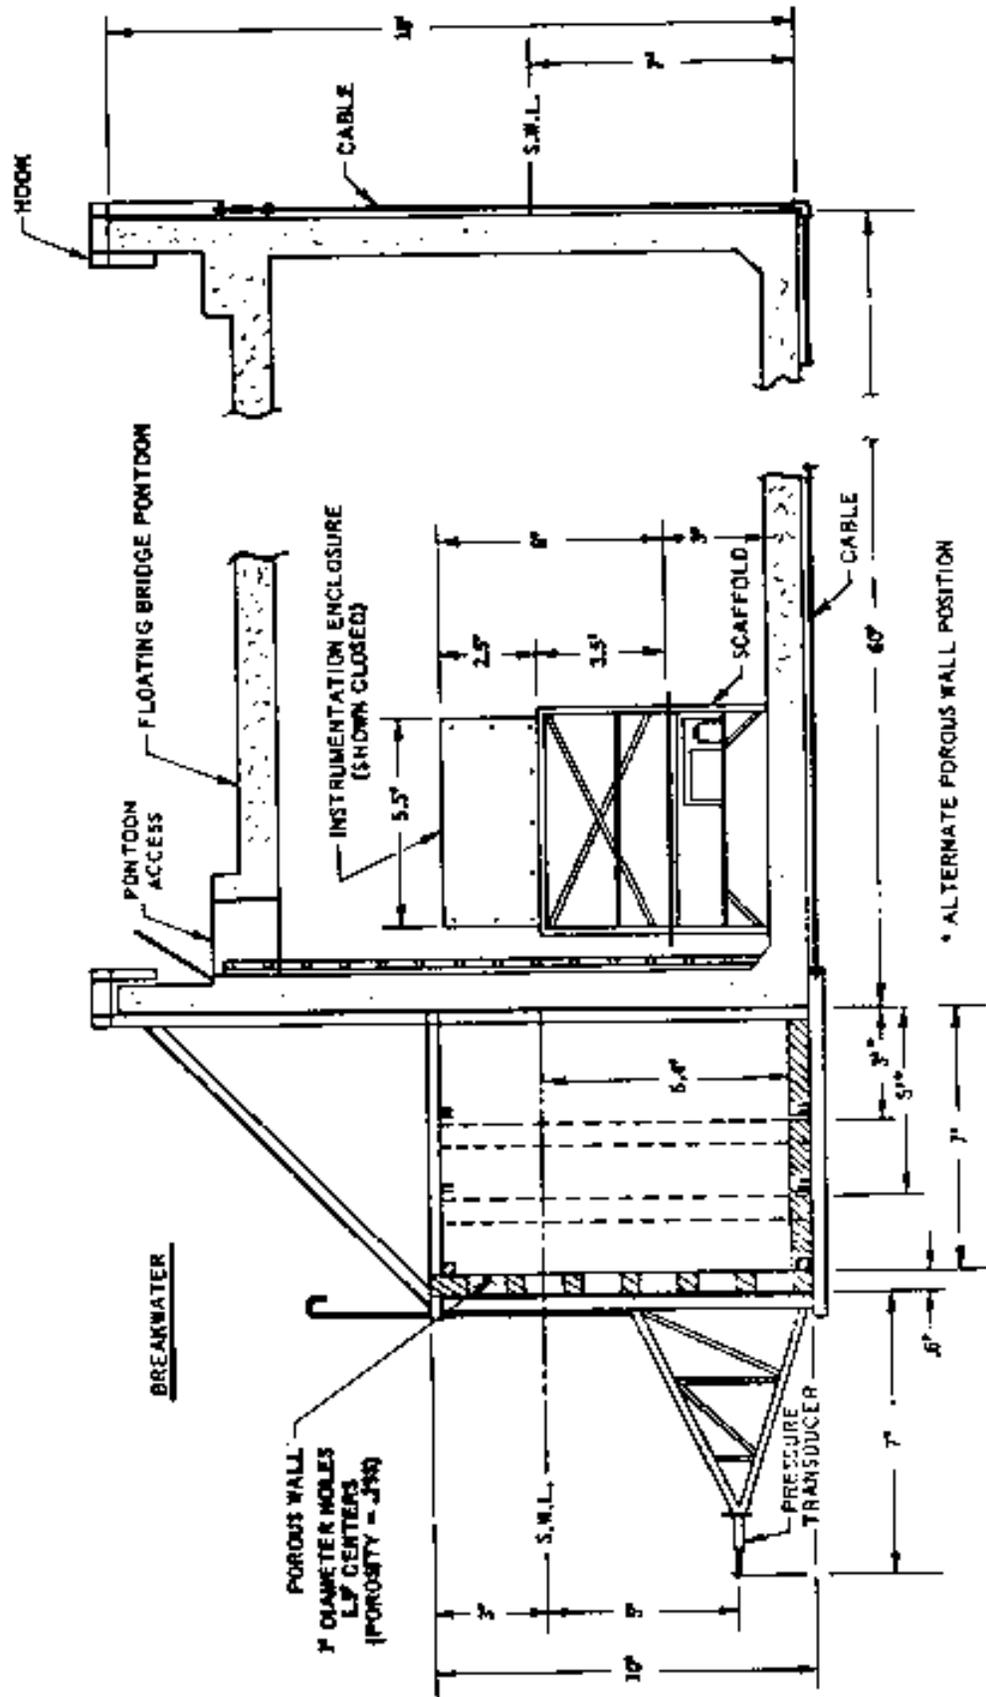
BREAKWATER SCHEMATIC (SECTION VIEW) INCLUDING KEY DIMENSIONS.
